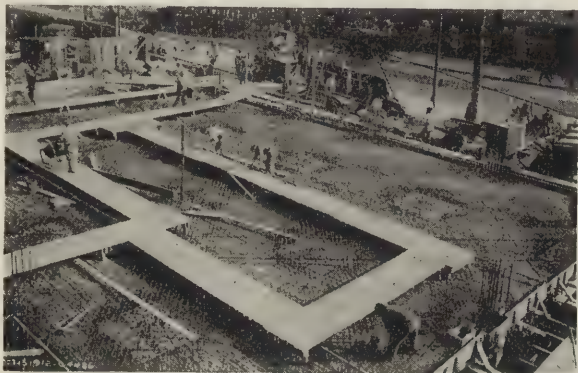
View illustrating flat slab construction. This also shows to good advantage the concreting plant and runway for buggies used in depositing concrete.
